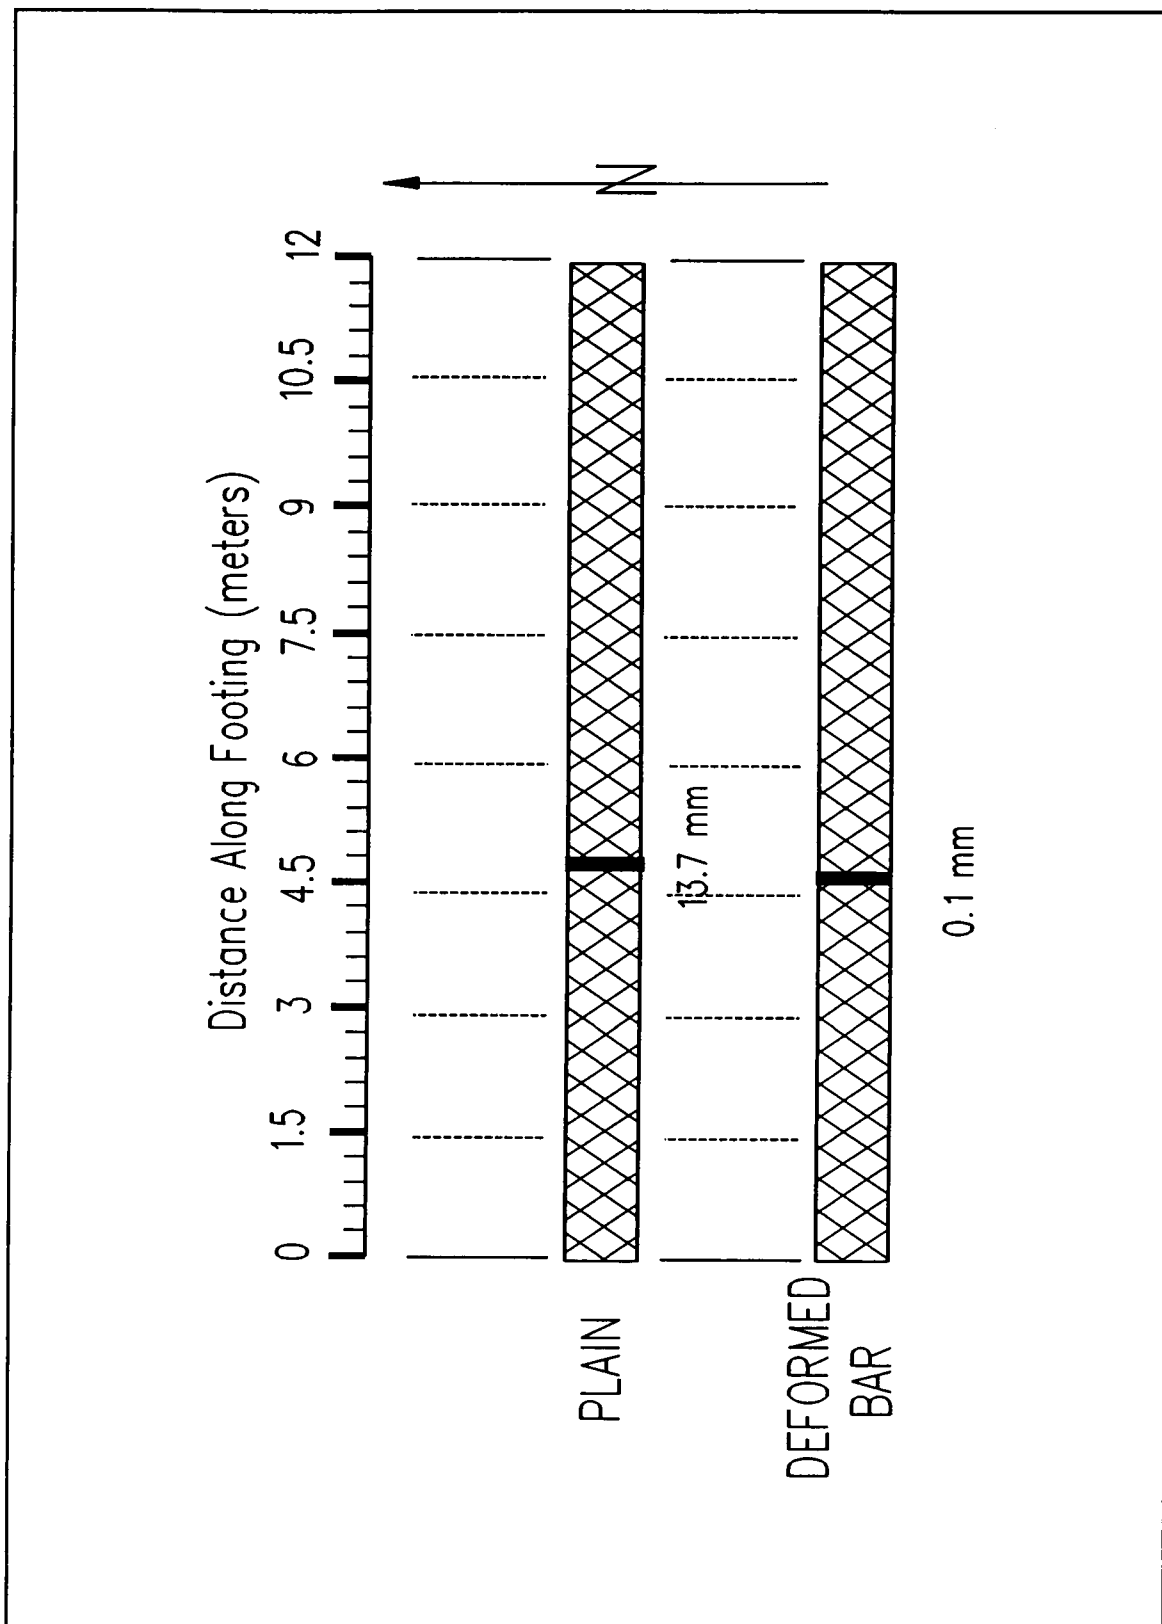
Crack Locations for Footings, Day 90 (after Lin, 1992b)
